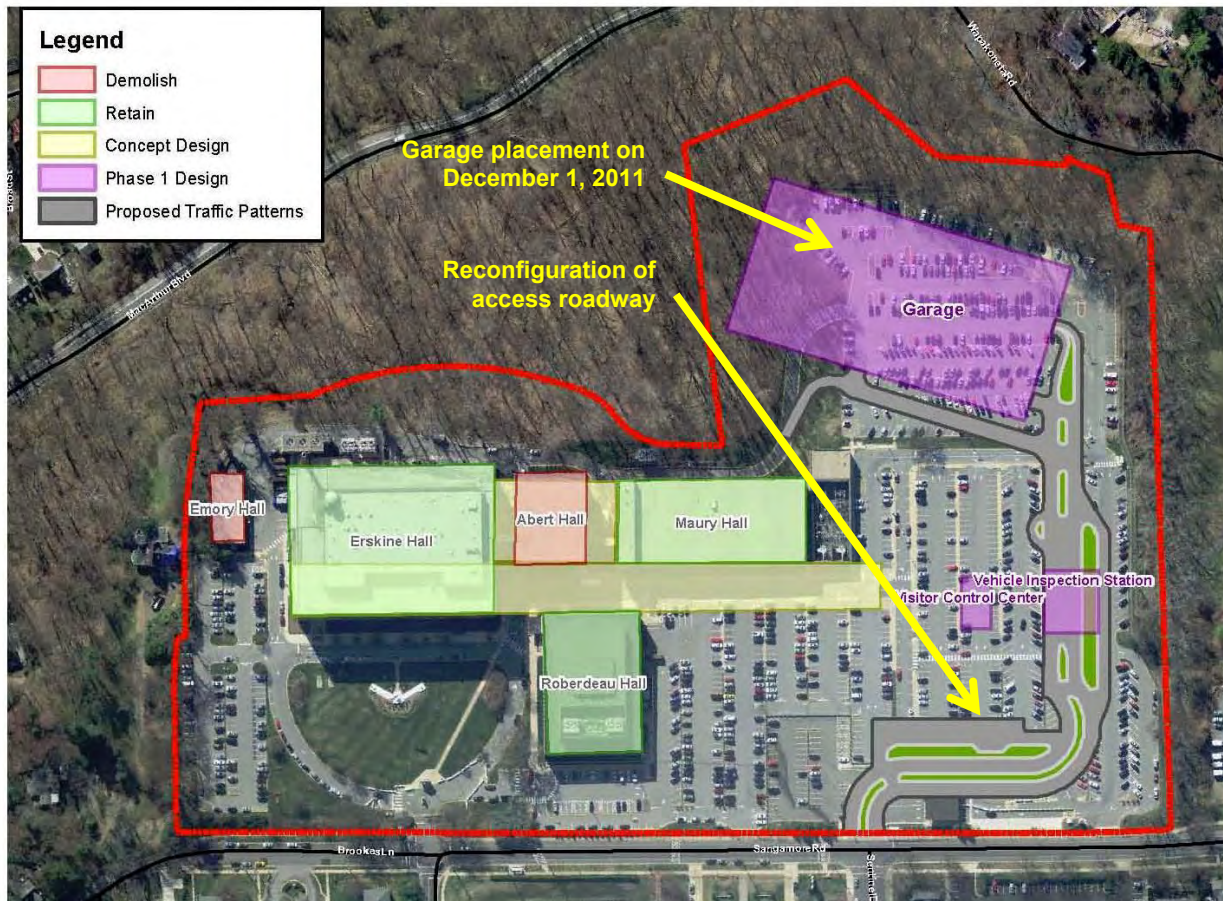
December 1, 2011 site plan presented to the Commission by USACE with revised access road. In addition to reducing the size and orientation of the garage, USACE studied a reconfiguration of the installation's access road that puts it back to form a four-way stop at Sangamore Road and Sentinel Drive.
